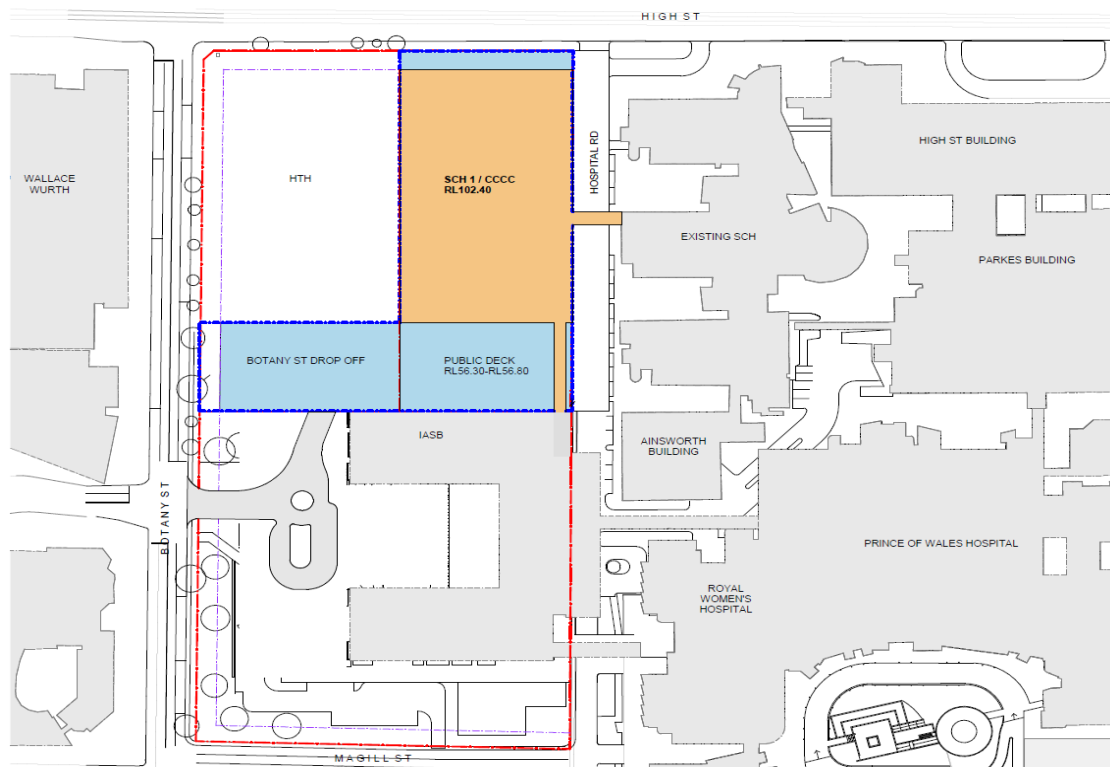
Architectural masterplan layout SITE PLAN -SCH1-CCCC SCOPE -PwC RO 2
